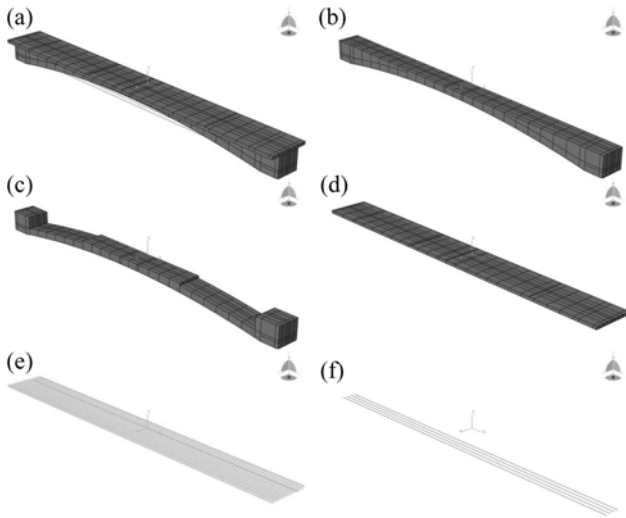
FEM modeling of structural components of CFTA girder. (a) overall, (b) steel box, (c) in-filled concrete, (d) slab concrete, (e) slab steel, and (f) post-tensioning tendons
